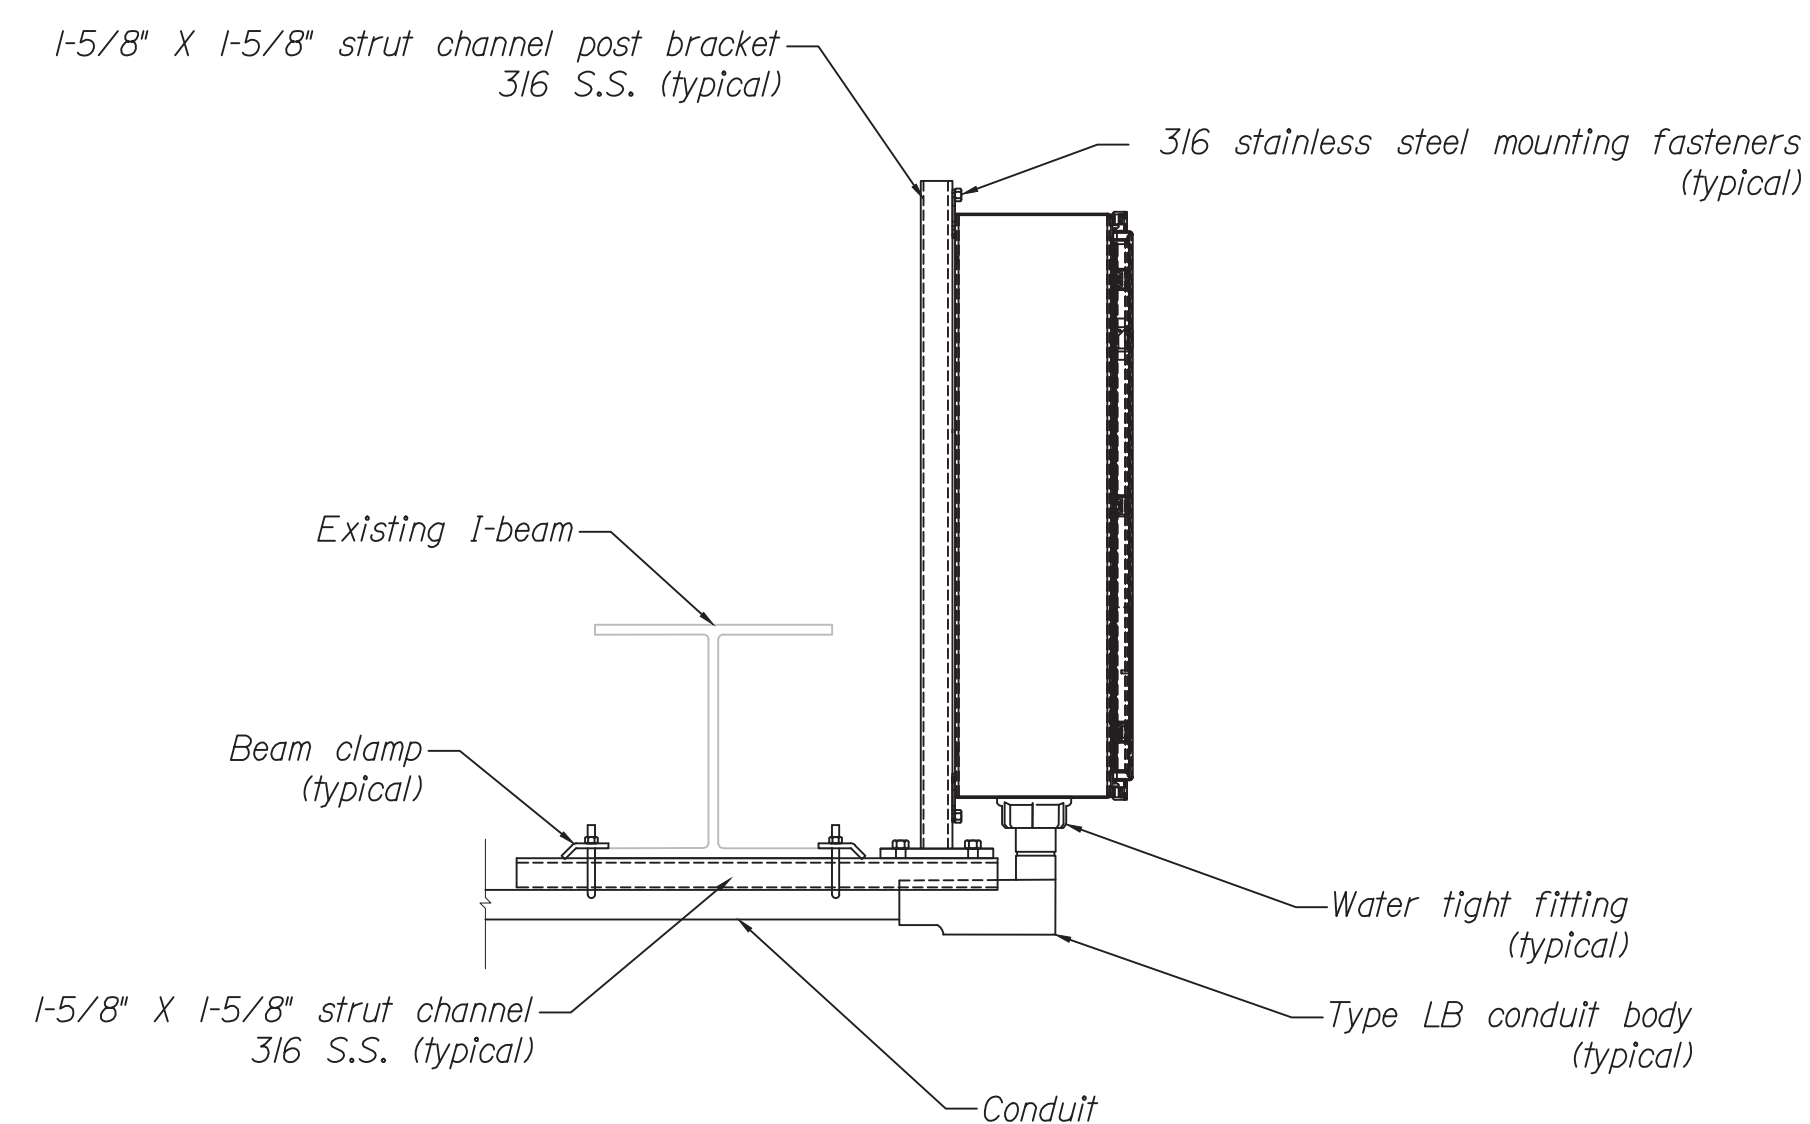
PIER 3 CONTROL SUBMARINE CABLE
